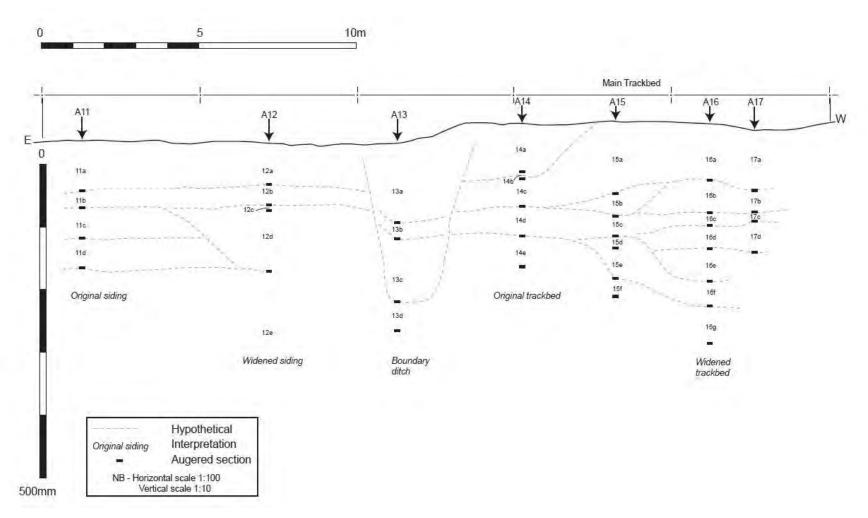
Profiles 8 with augur readings plotted and hypothetical section constructed. Horizontal scale 1:100, vertical scale 1:10
